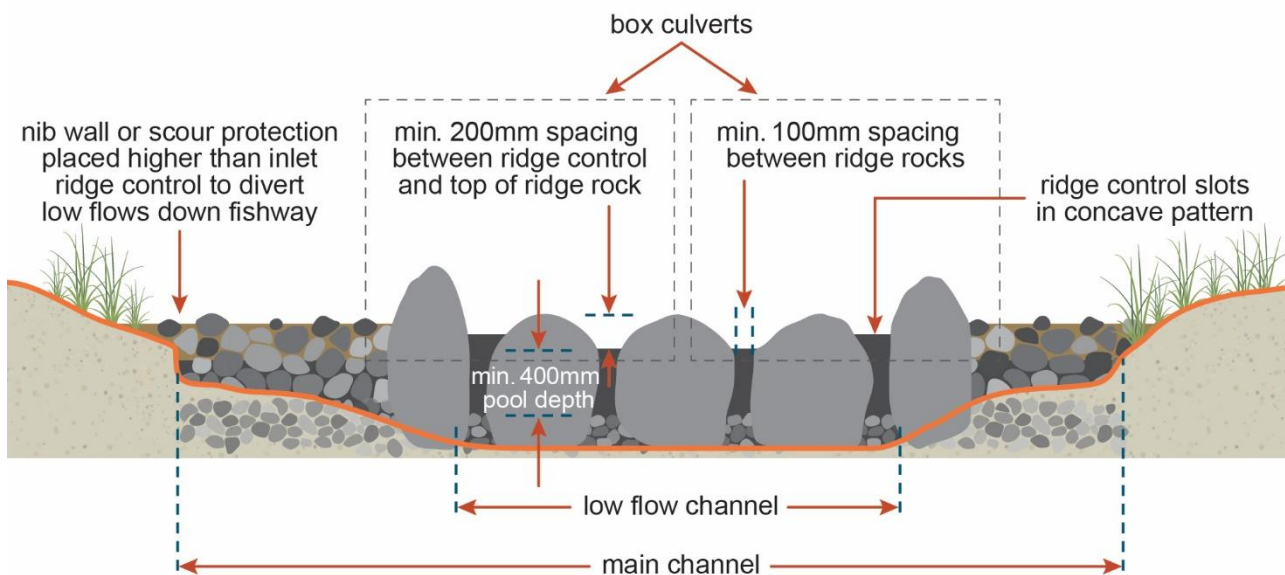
Interim partial-width rock ramp fishway on existing culvert crossing (cross-section of waterway) – amber and green waterways
